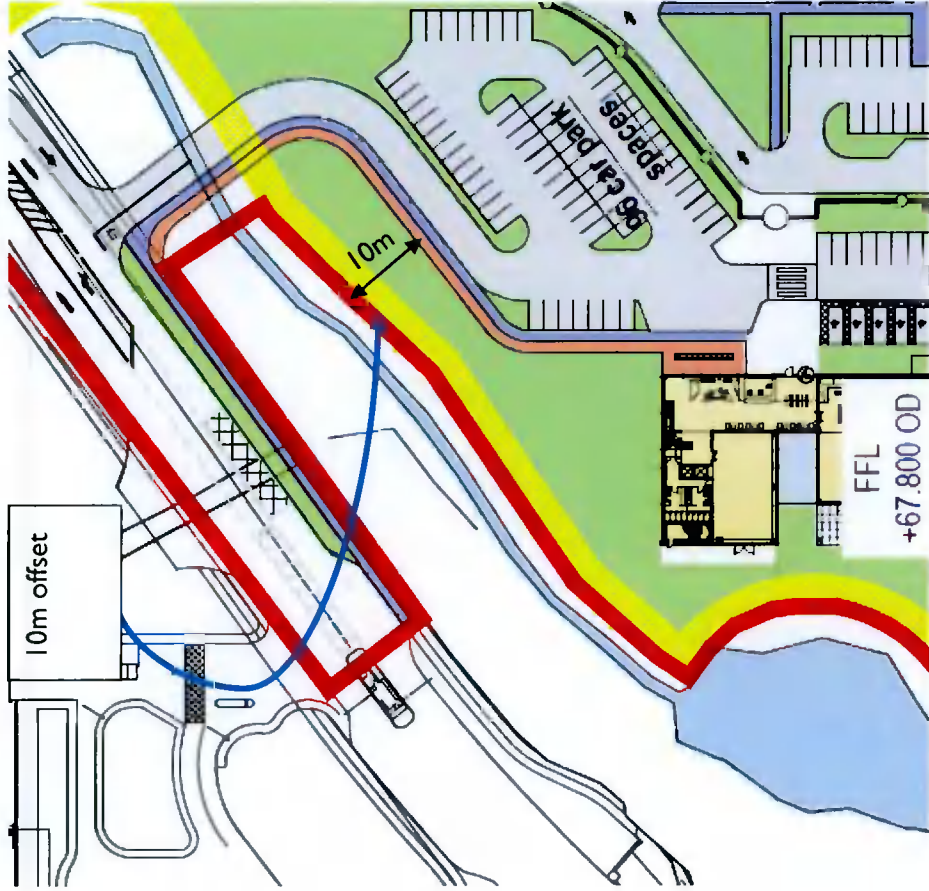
Proposed Car Park Layout modified layout showing 10m landscaped margin set out from top of bank
